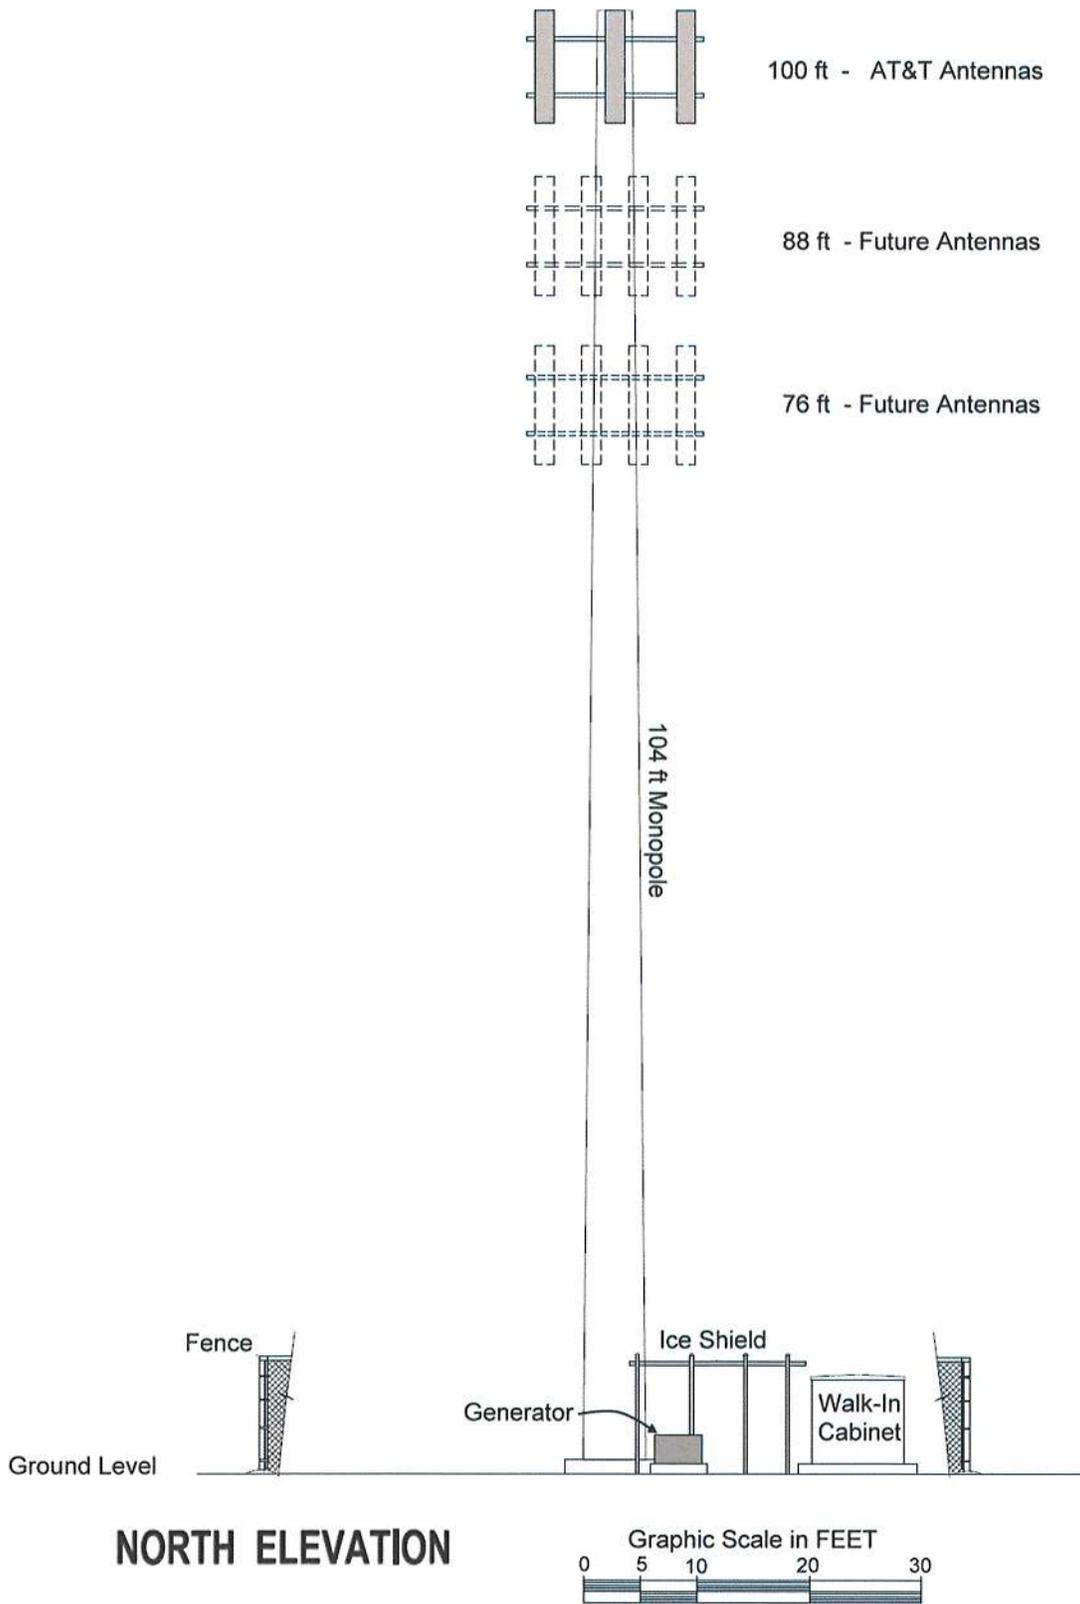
Plan Showing the Proposed Elevation Character of the Project
